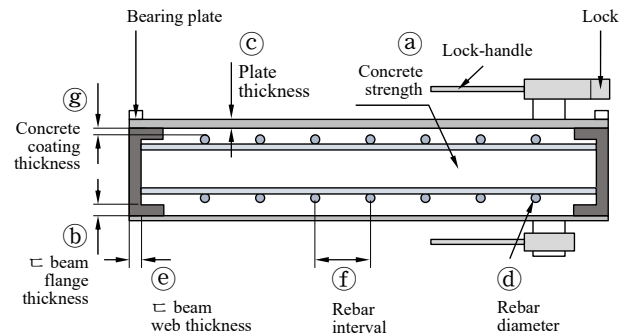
Section of single blast door (section A-A of Fig. 3)
